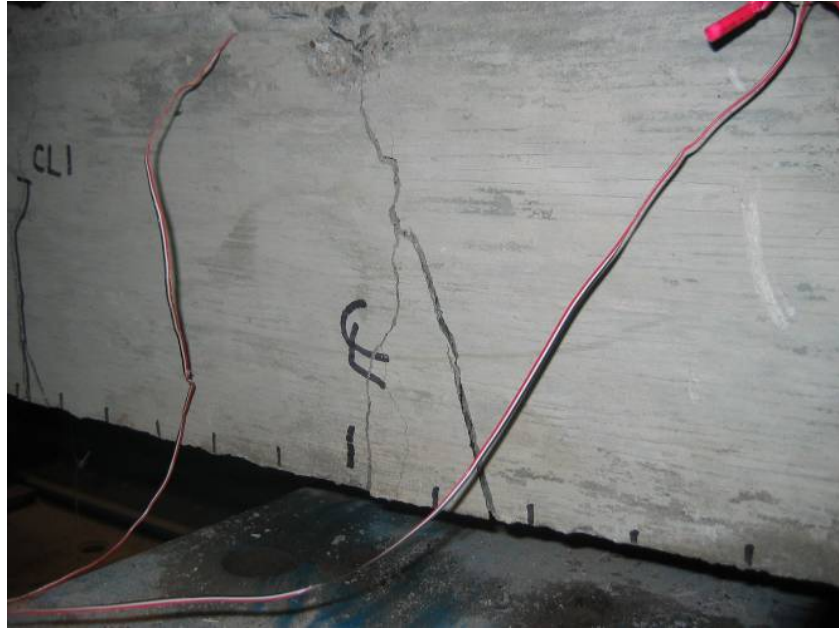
Soffit longitudinal cracking caused by rotation of the QuickWedge coupler shown on Specimen Q (figure shown looking along beam's length.)
